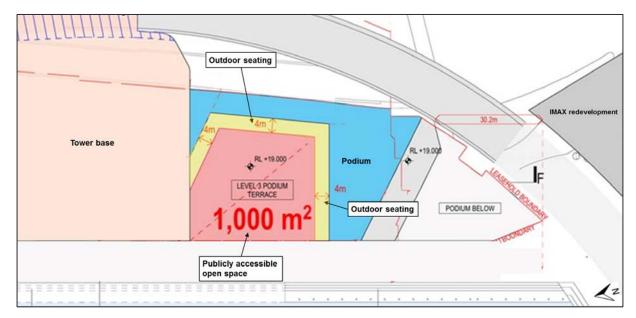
| Building envelope at the southern end of the development including indicative layout of the southern publicly accessible open space (highlighted red) and outdoor seating area (highlighted yellow) (source: Applicant's RtS)
